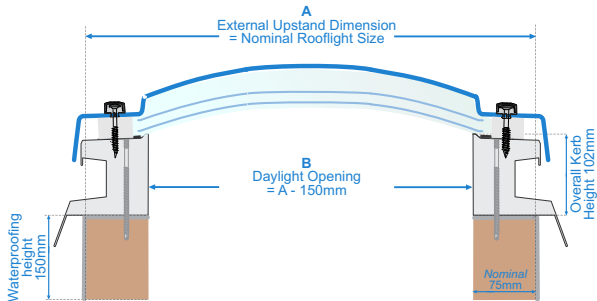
opening / ventilated dome without sloped or 300mm kerb
